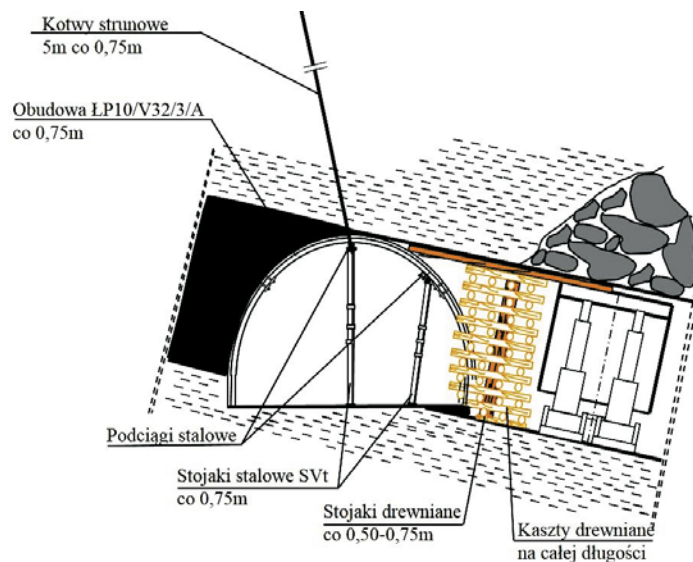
Scheme of stand and roof bolting system for maintenance of 7b roadway in 408/2 coal seam behind the longwall face
